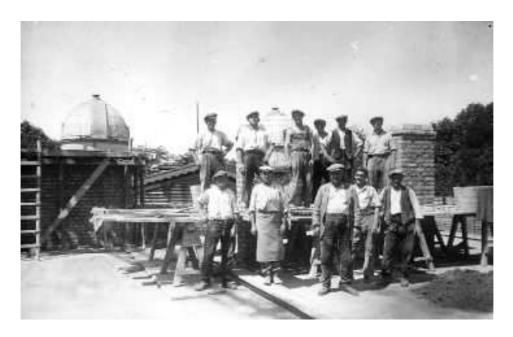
Construction of the Eastern Building. (© Obs. Astron. Strasbourg)
